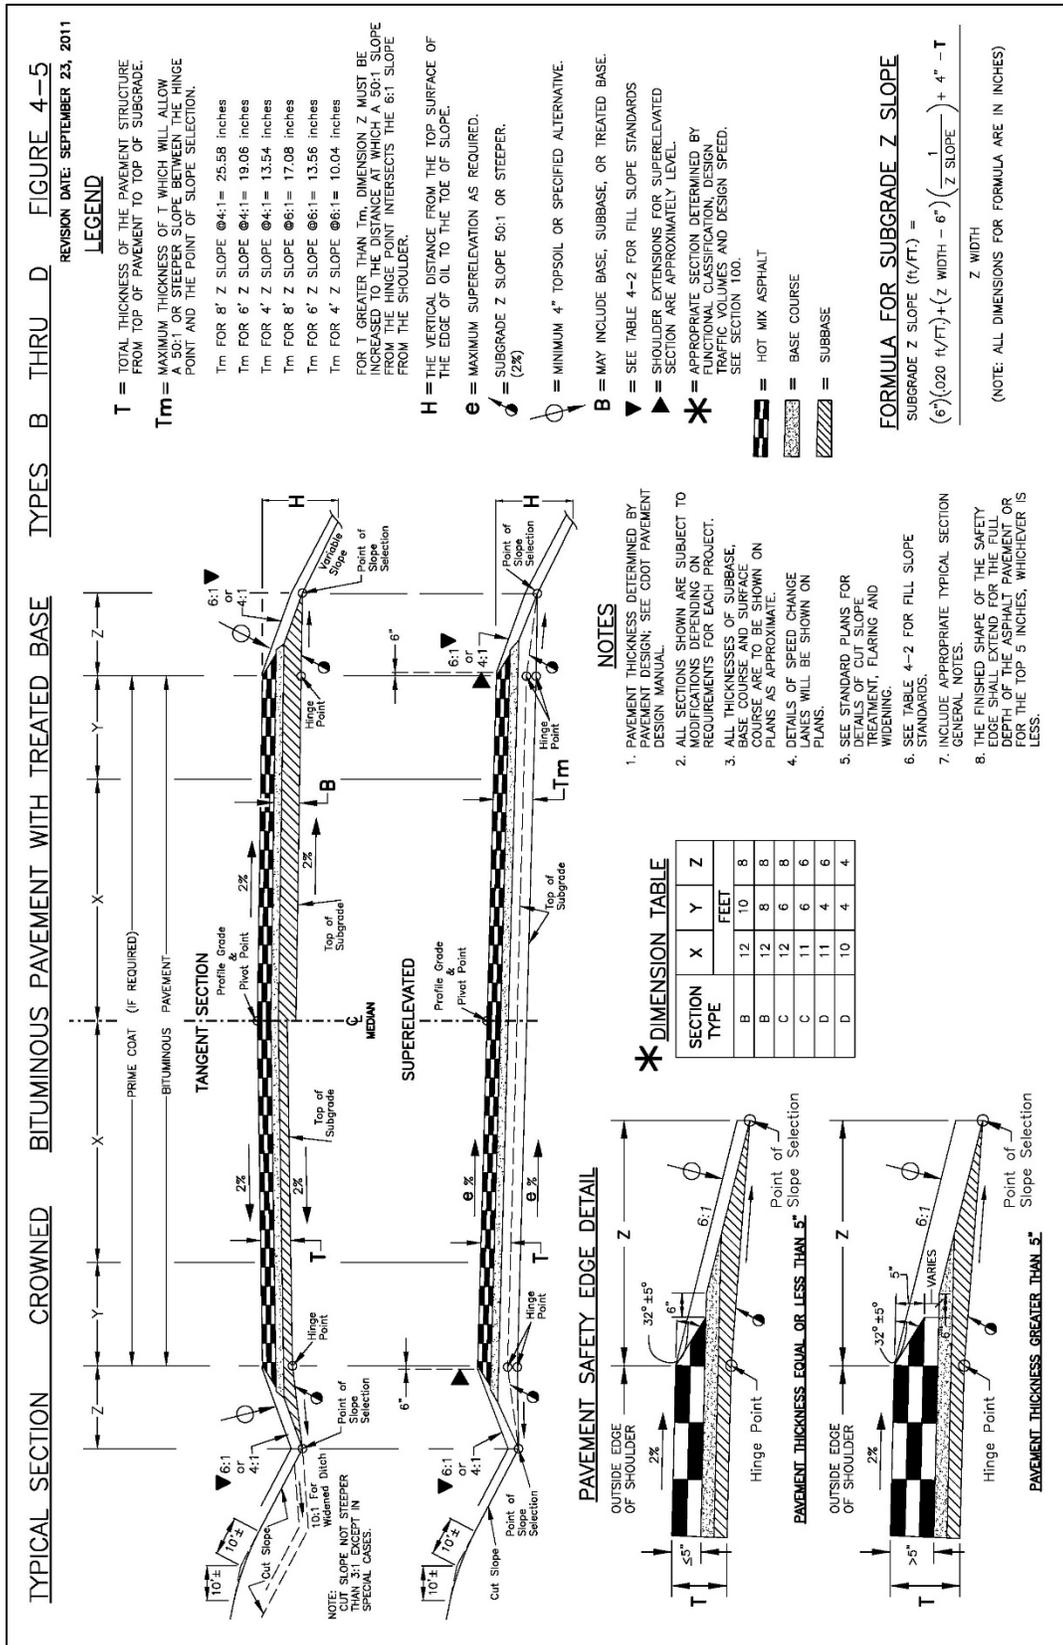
Typical Section for Crowned Bituminous Pavement
